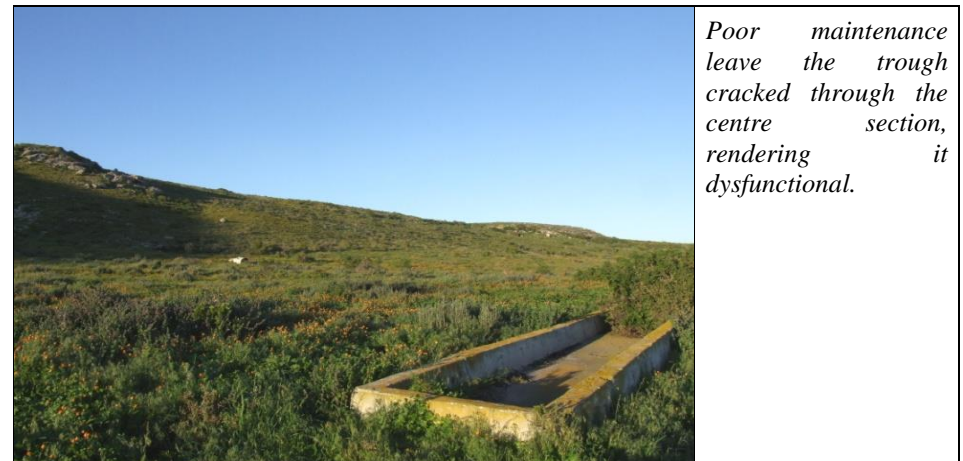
Deteriorating water-trough at Blouwildebeest Bay
